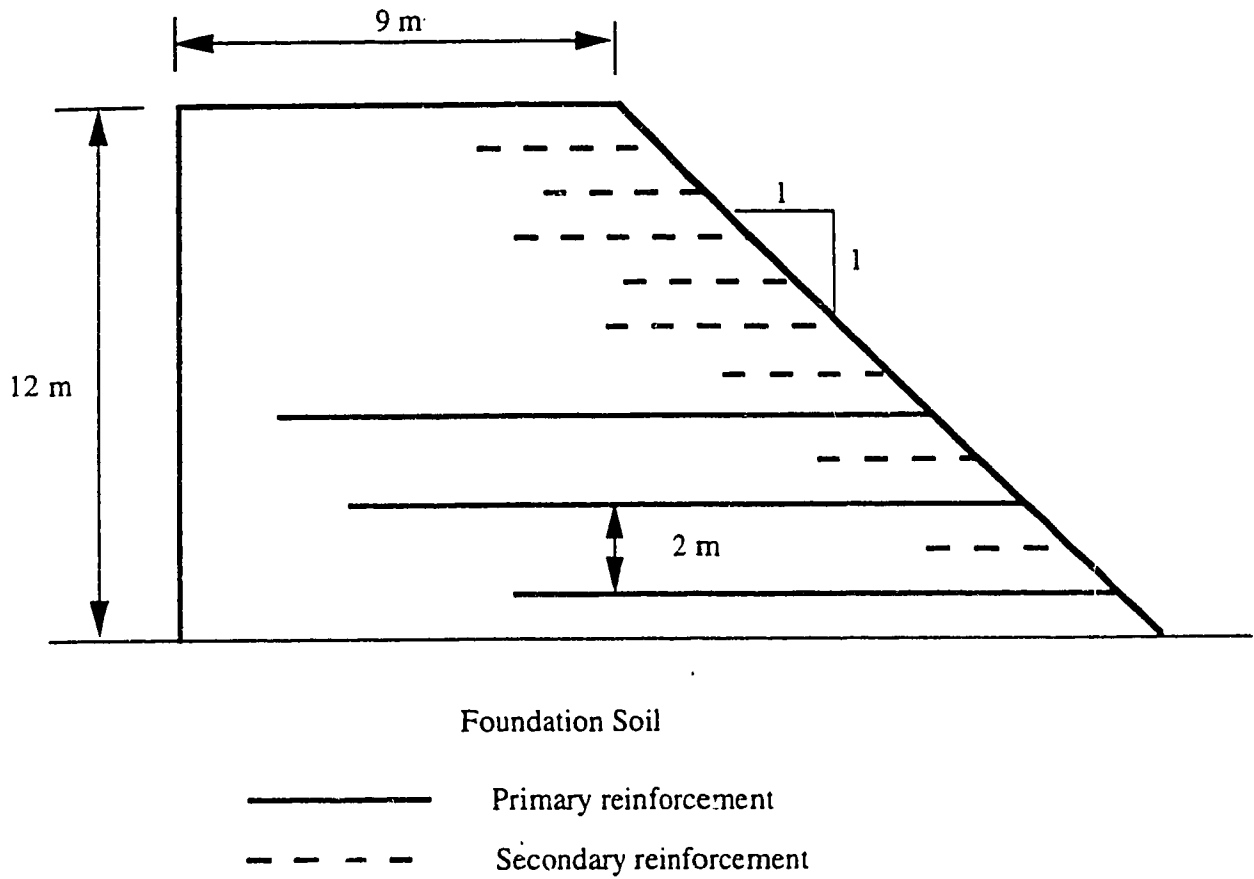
Cross Section and Reinforcement Layout of Reinforced Slope
